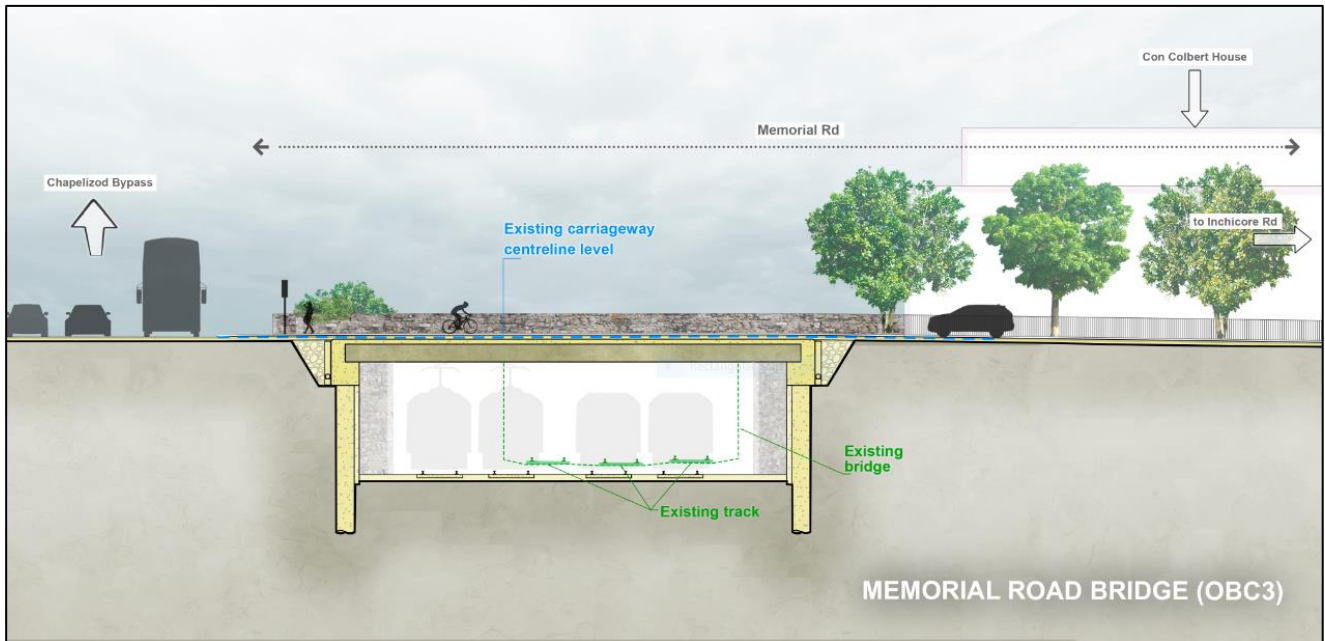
Emerging Preferred Option for Memorial Road Bridge (OBC3)
